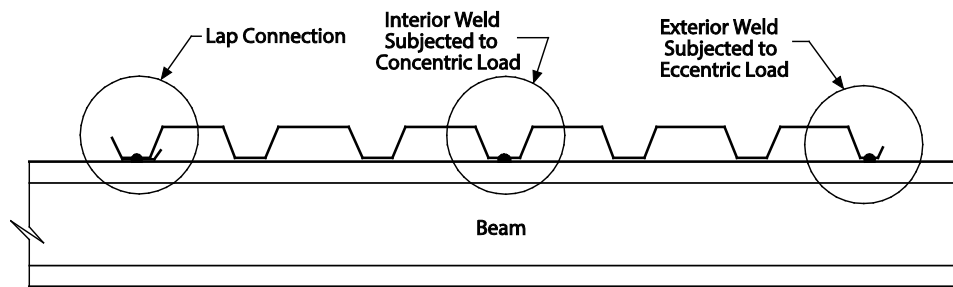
Interior Weld, Exterior Weld and Lap Connection
